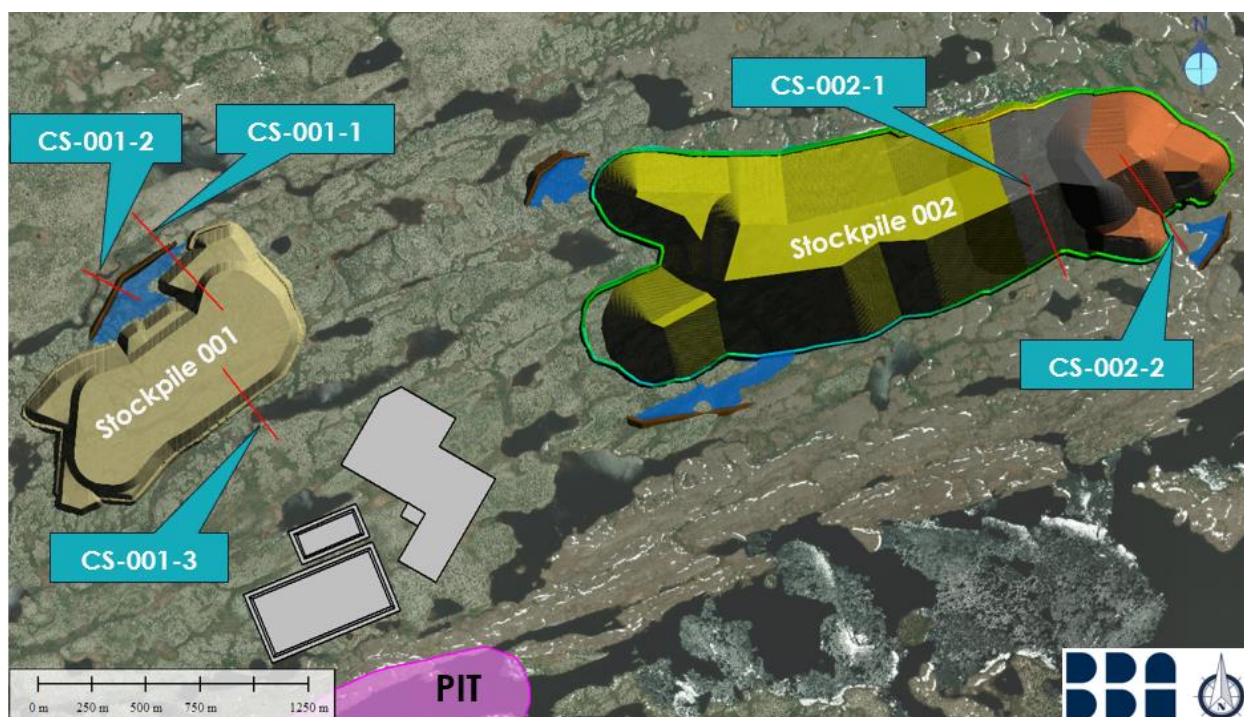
Cross-sections for slope stability analysis – Stockpiles 001 and 002
